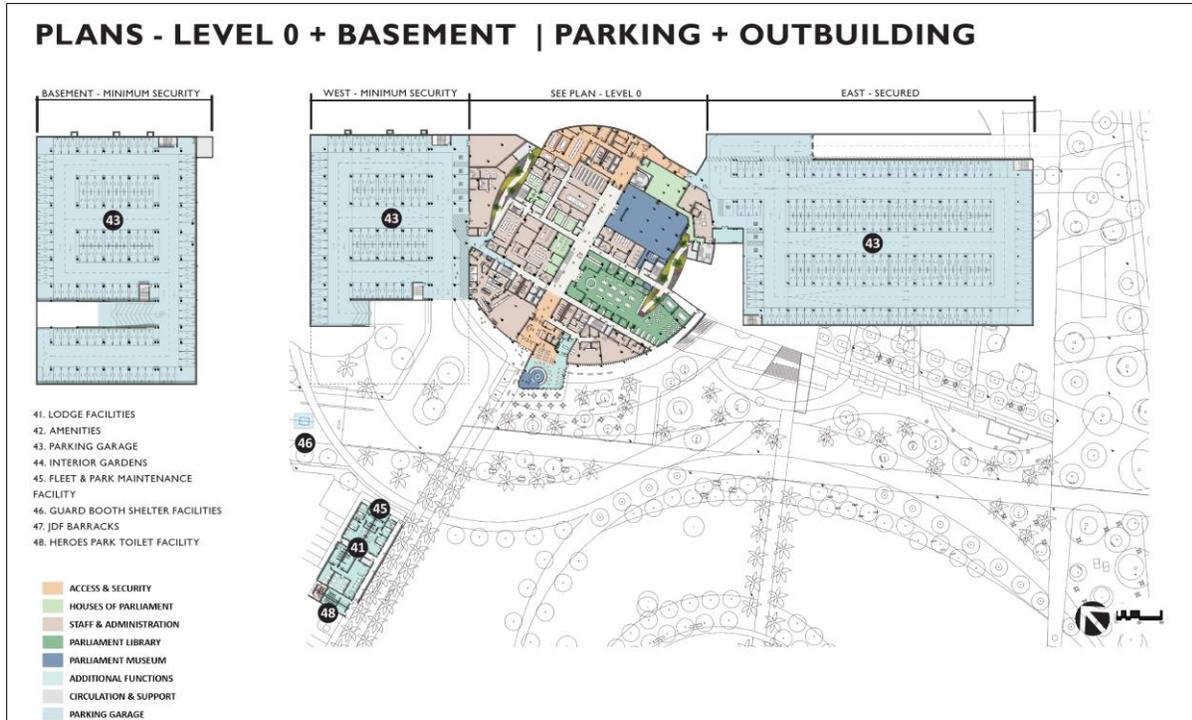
Houses of Parliament building plan –Level 0 and Basement
